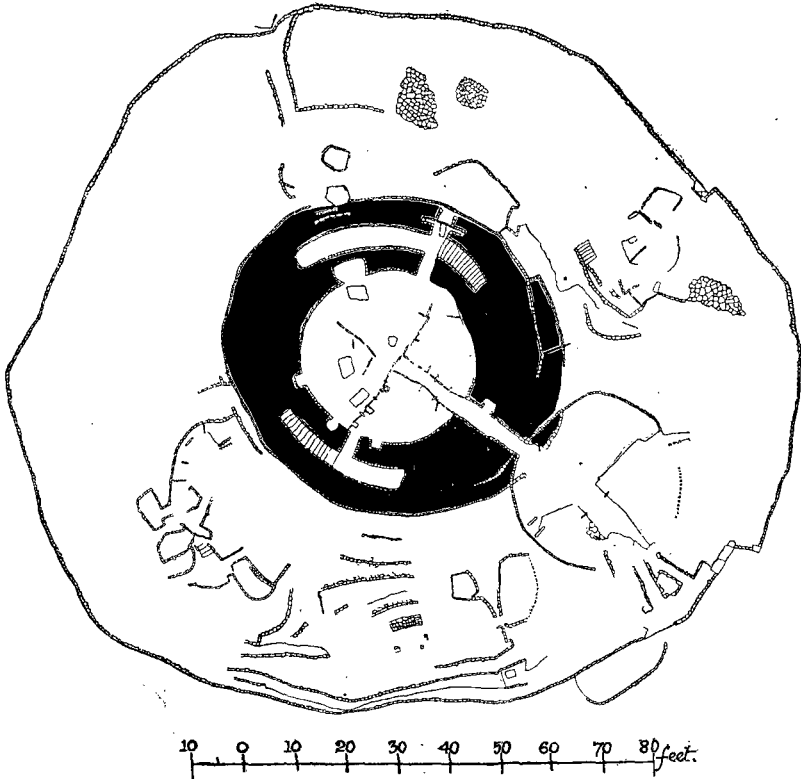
Ground Plan of the Road Broch and its outbuildings, with the encircling wall.
